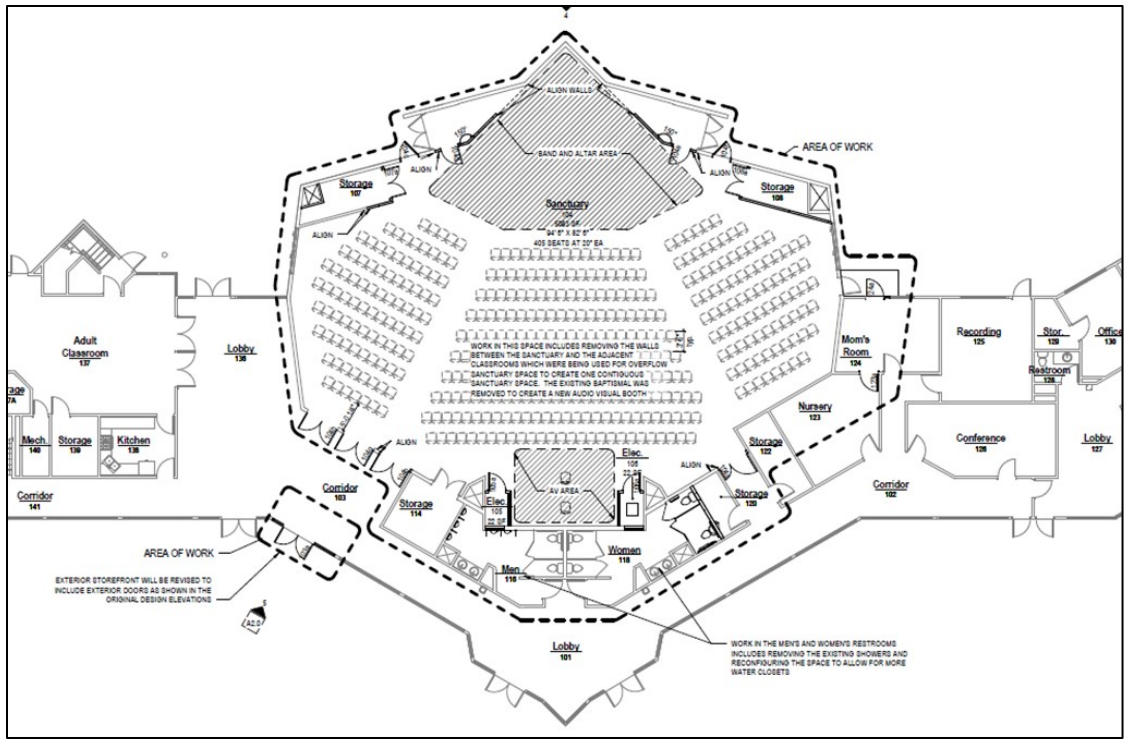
Proposed floor plan, with areas of work indicated by dashed lines.
